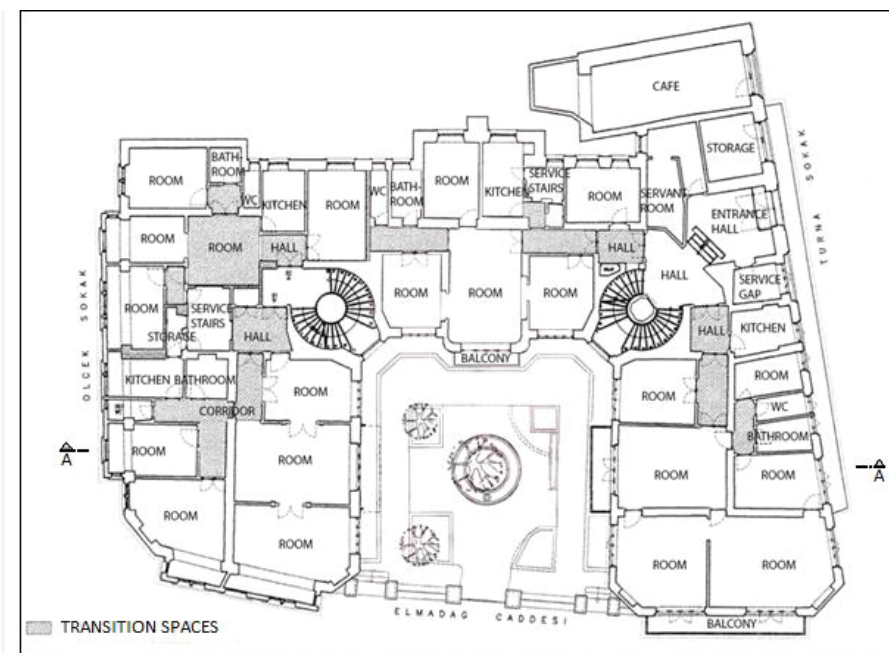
First floor plan of Arif Pasha Apartment ( Source: Öğrenci 1998)
